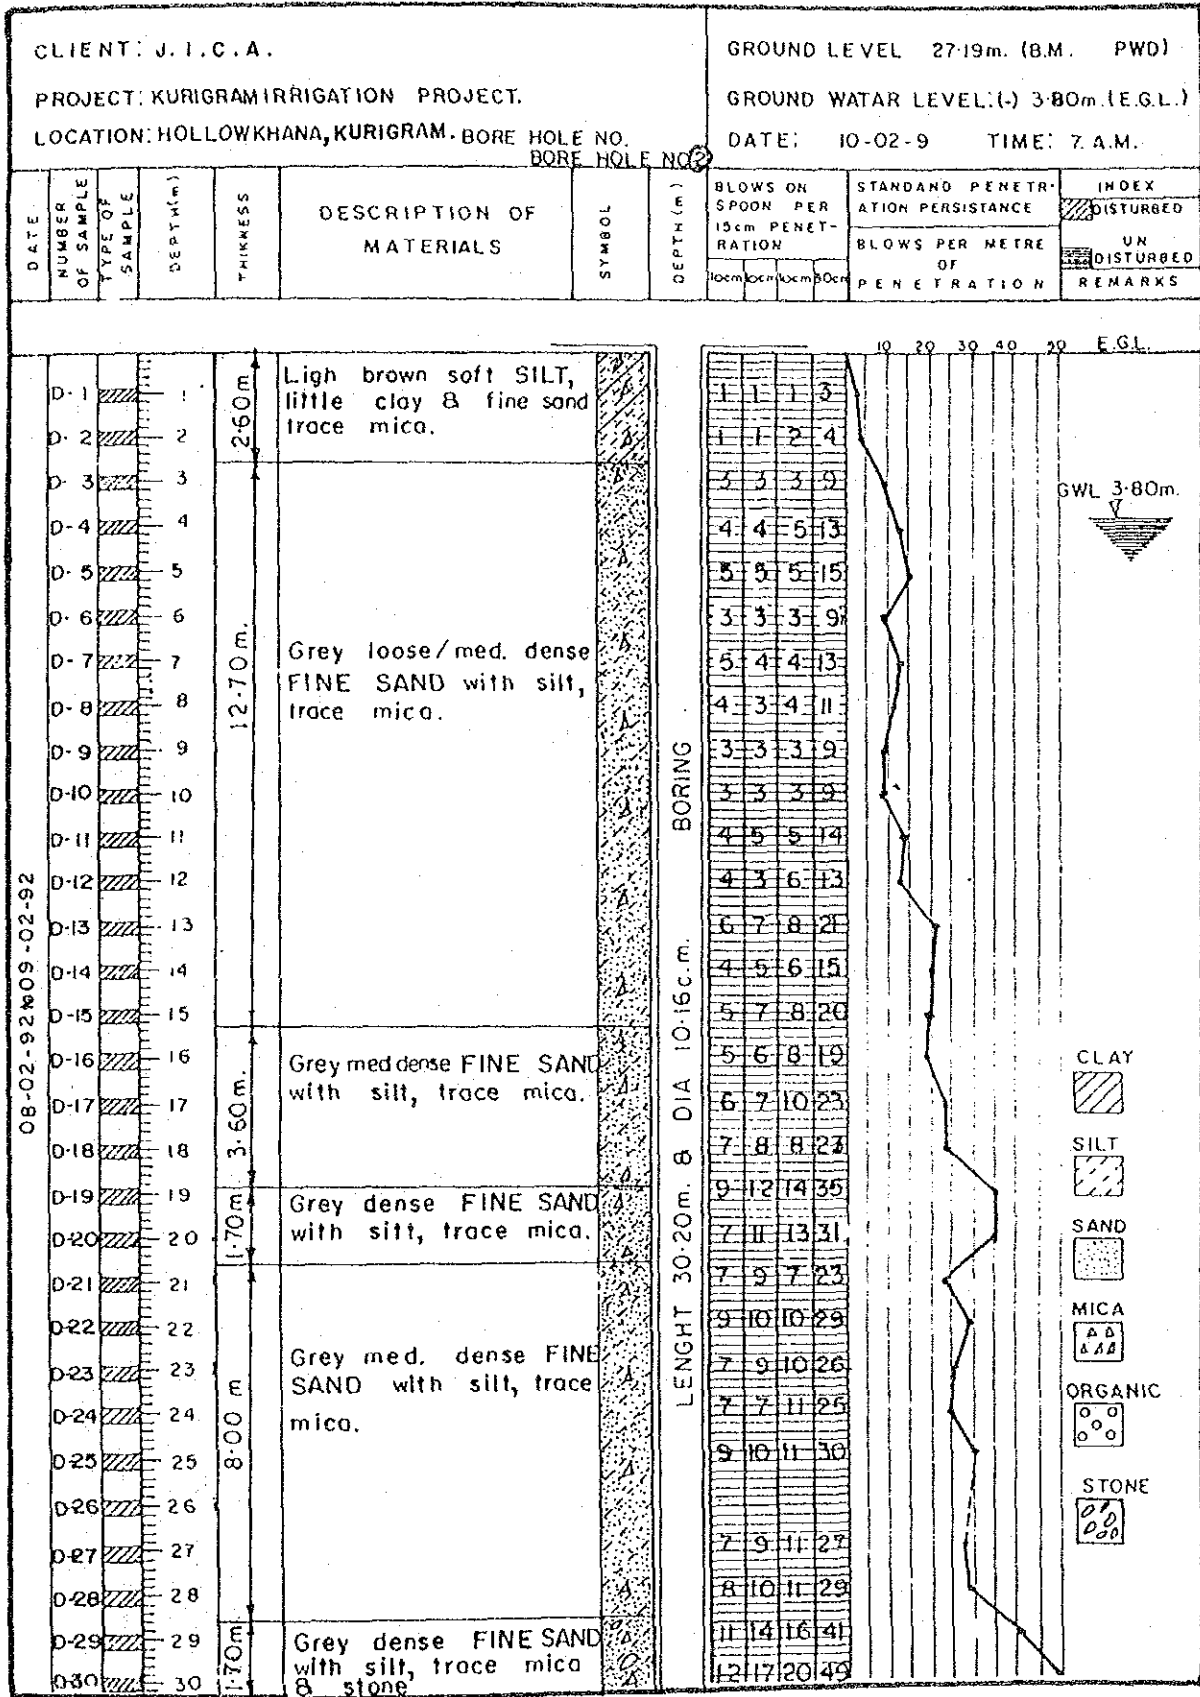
PROPOSED PUMPING STATION SITE (4/8)
